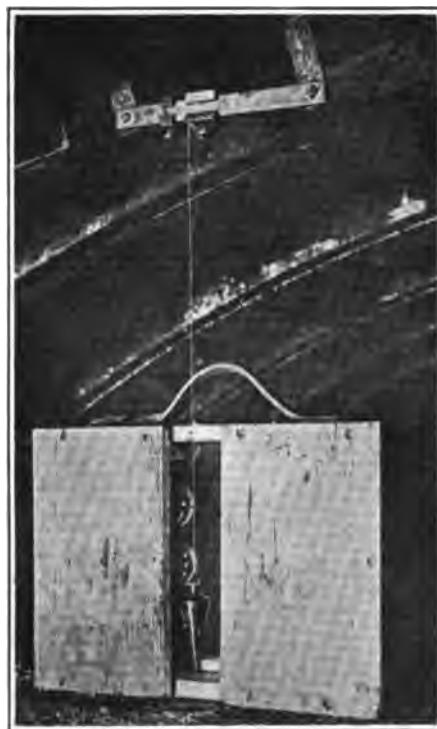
A vernier "alignment bar" in a cast-iron lined tunnel, showing the plumb-line hanging from it and a light box of the second or shrouded type (see text, Par. 87) behind the plumb-line. Pennsylvania Railroad Hudson River Tunnels (A-18). (Courtesy of *Pennsylvania Railroad*).
